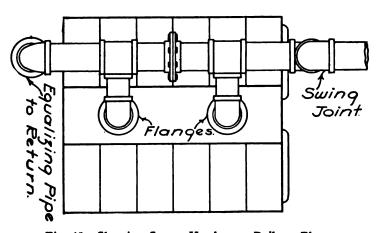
Showing Steam Header on Boiler.—Plan.
